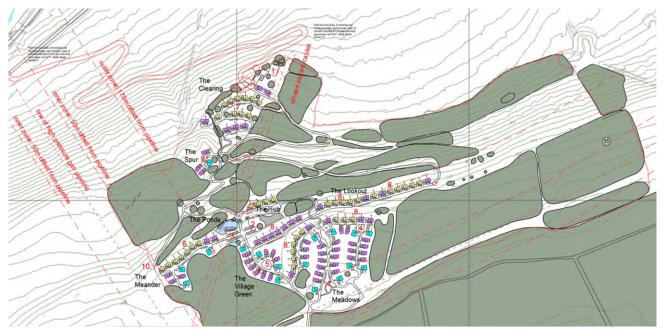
2D Plan of the proposed Parc Pelenna site.
